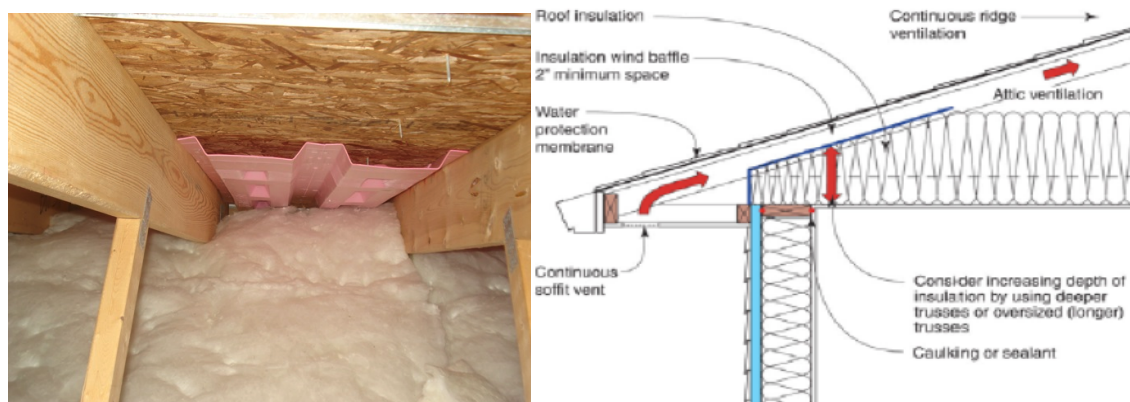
Example of a baffle in an attic to allow air ventilation passed insulation.
